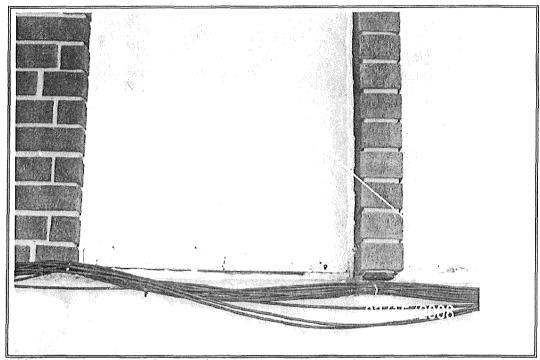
Photograph Number 9: Masonry veneer cracks and spalling.
